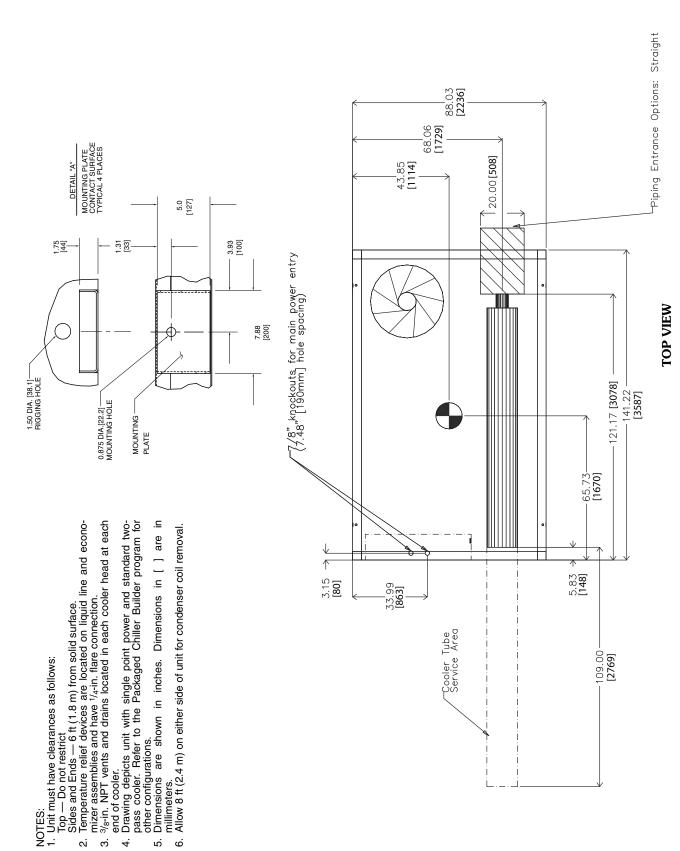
30XA080 Air-Cooled Liquid Chiller Dimensions
